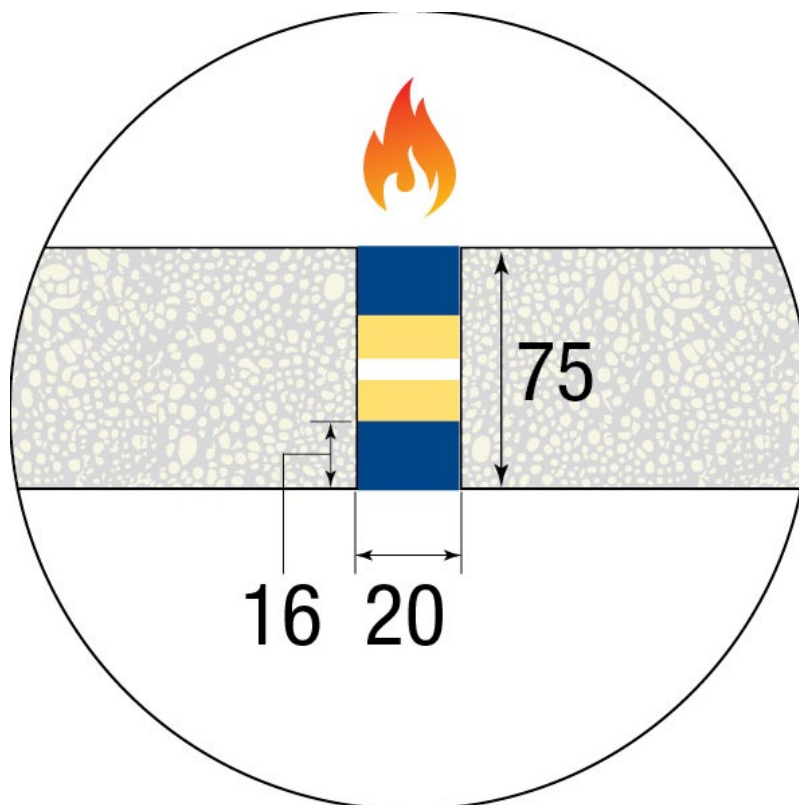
Client Supplied Drawing - Specimen A - Section View
